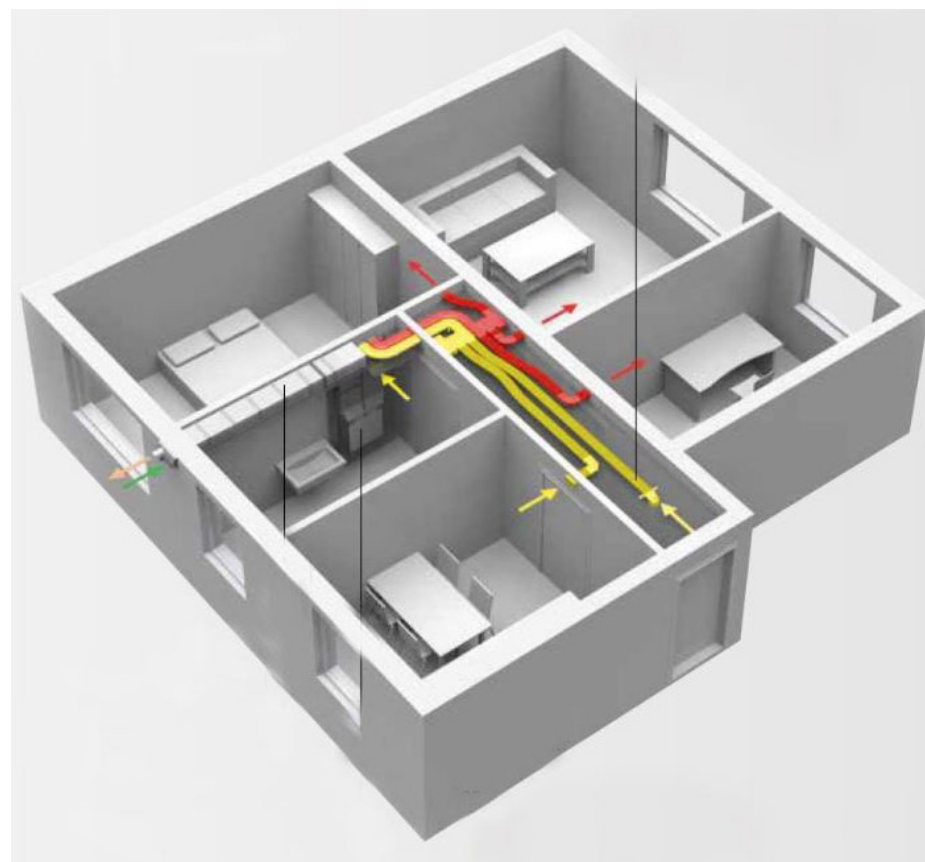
Typical flat layout showing an individual flat system with MVHR ductwork running to and from individual rooms via corridor
